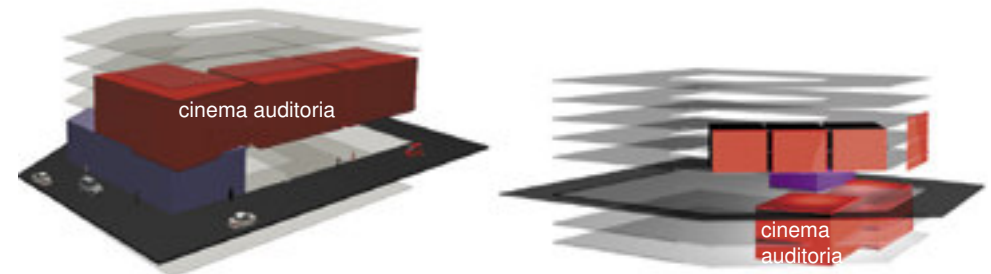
Concept of building layout (April 2005) Fig 86. Concept of building layout (June 2005)
